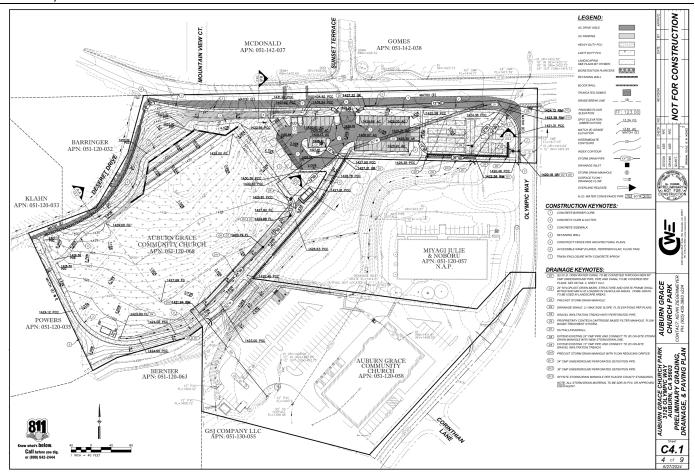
Site Plan Preliminary Grading, Drainage, and Paving Plan sheet
